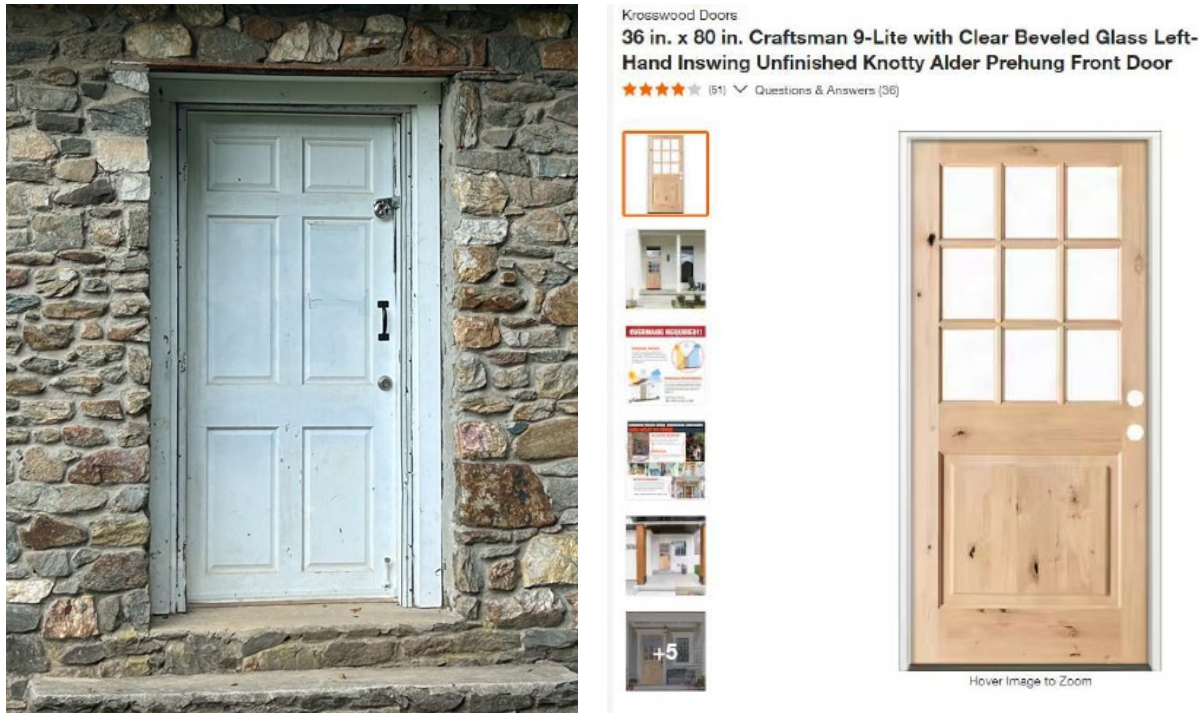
The existing wood door and masonry opening (left) and proposed door (right).
